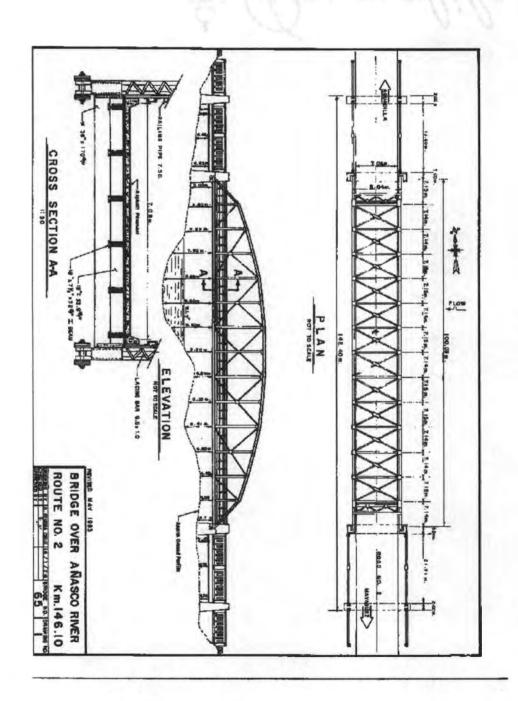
Elevation, Plan and Cross Section A-A (revised in 1983) for Bridge #65. Bridge Engineering
